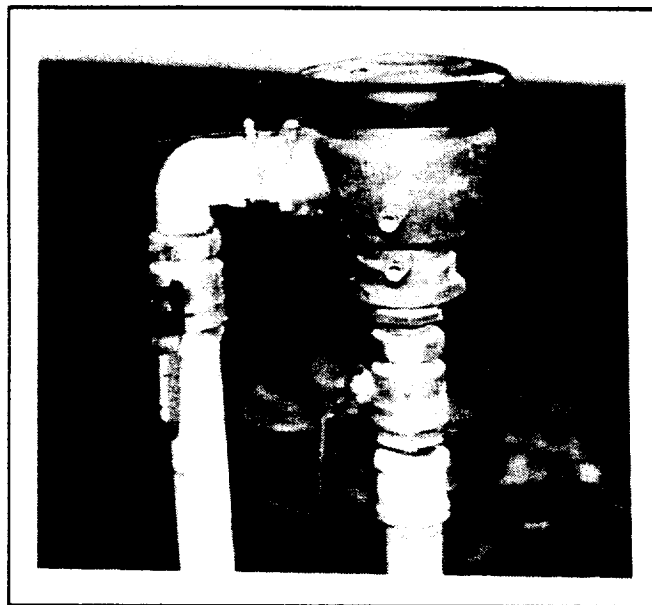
Typical Pressure Vacuum Breaker Assembly.
